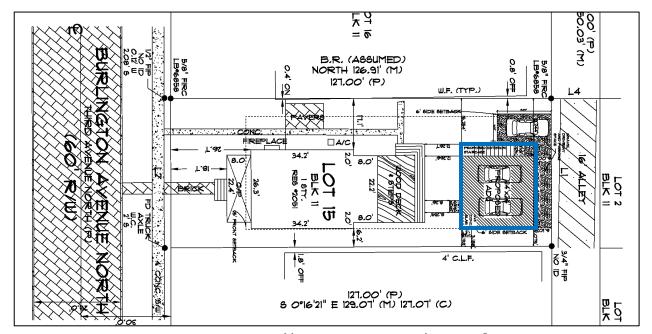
Proposed site plan from application 22-90200063. New ADU is outlined in blue.
